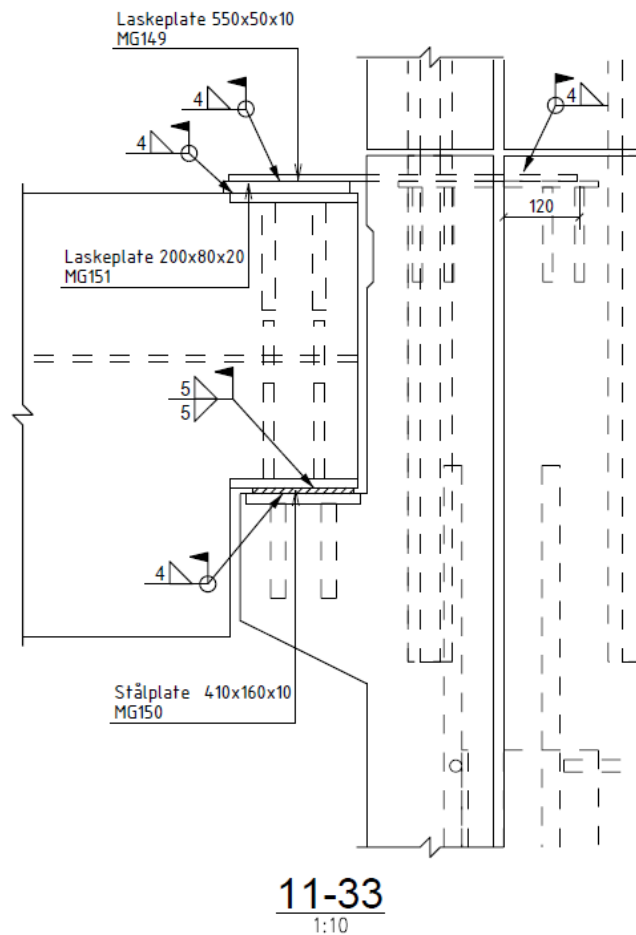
Concrete column - beam connection provided by the consulting company Core Technology
